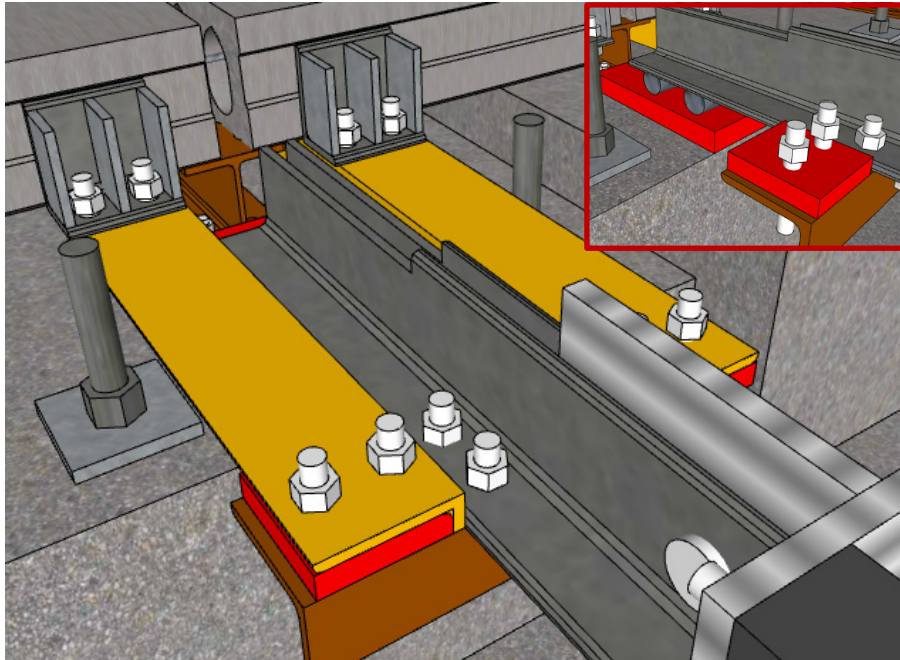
Part of the assembly at the beginning of connection (the steel angle beams - yellow color-are not shown in the framed drawing for clarity).
